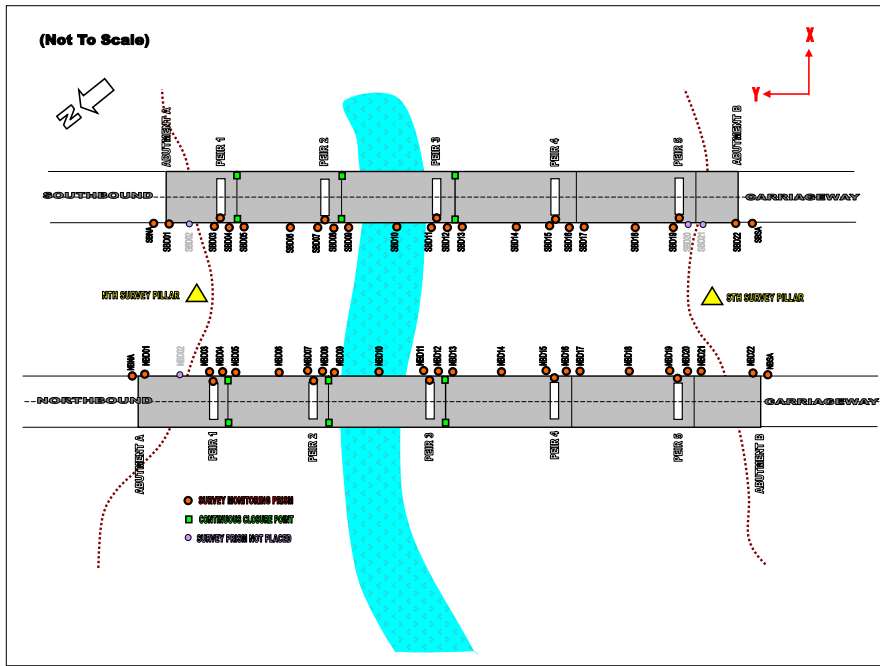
Plan of the relative 3D monitoring points on the Douglas Park Twin Bridges (Source: IC)
